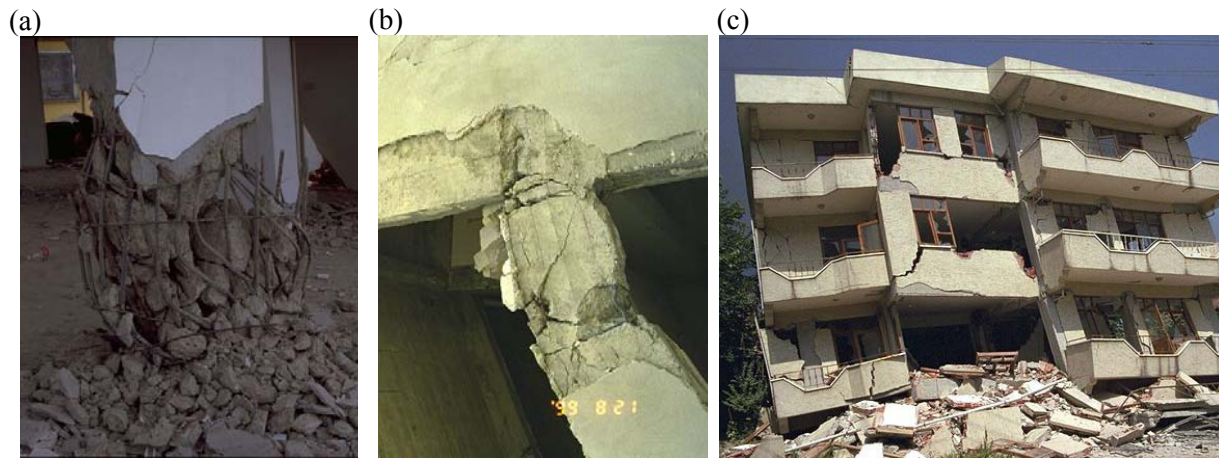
Damage of non-ductile RC frame buildings subjected to the Kocaeli earthquake: (a) lap-splice failure in RC column; (b) damage in beam-column joint; (c) soft-story mechanism [Earthquake Engineering Online Archive, NISEE E-Library]
